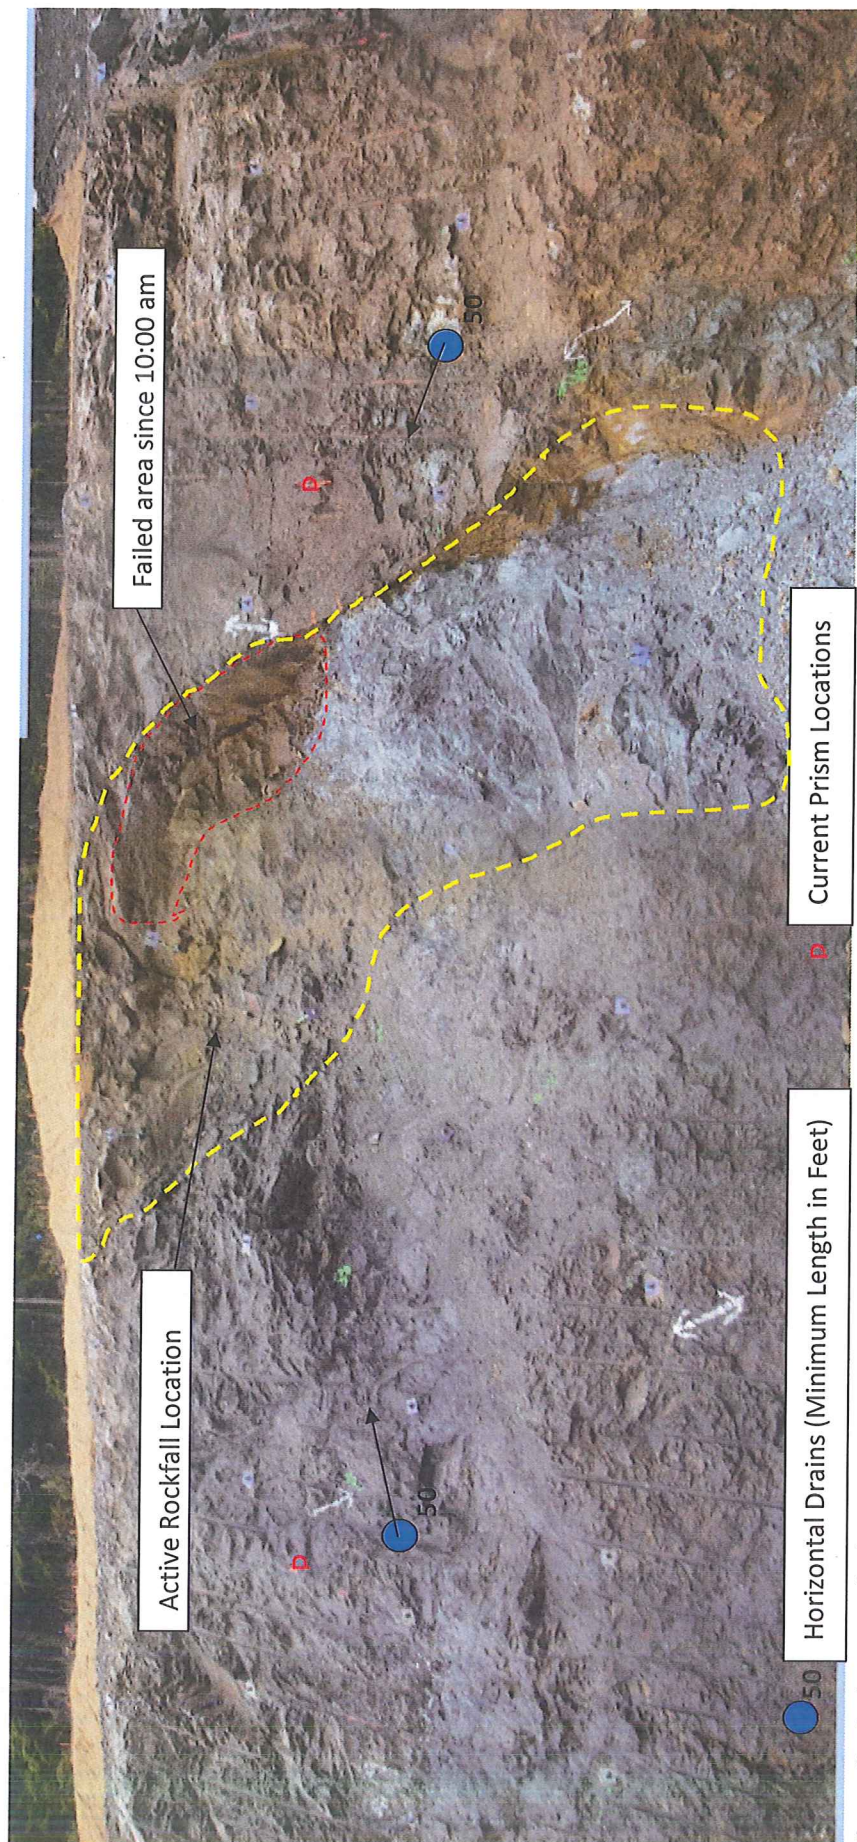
A photograph showing the recent failure location around station 1325+00. The horizontal drains should be directed towards the active failure location. Note that the prisms on either side of the recent failure location show nominal to no movement.
